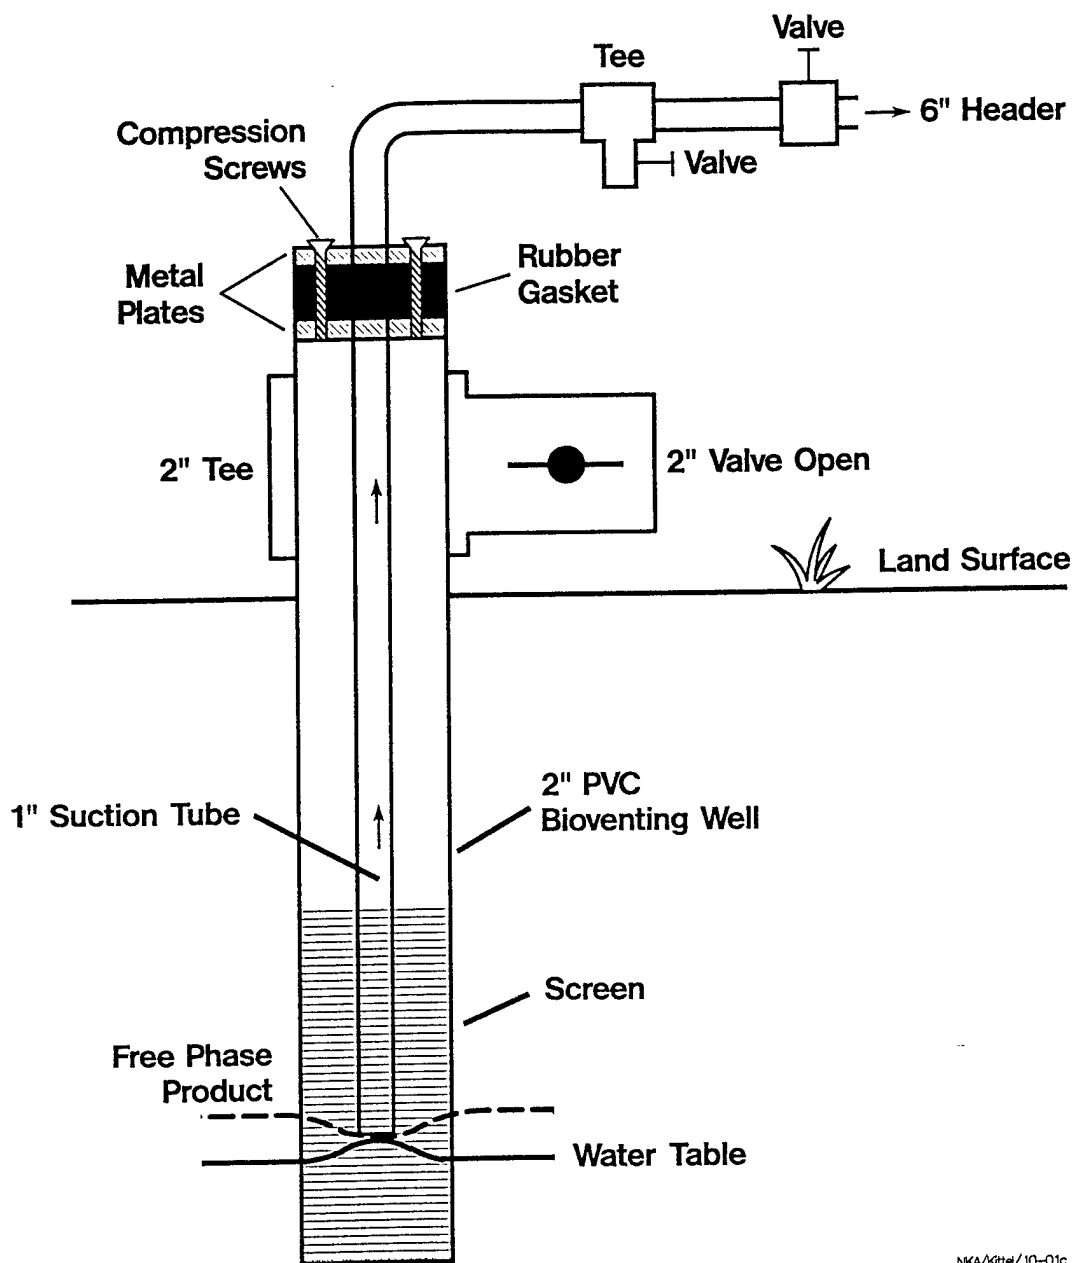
Drop Tube Placement and Valve Position During the Skimmer Pump Test
